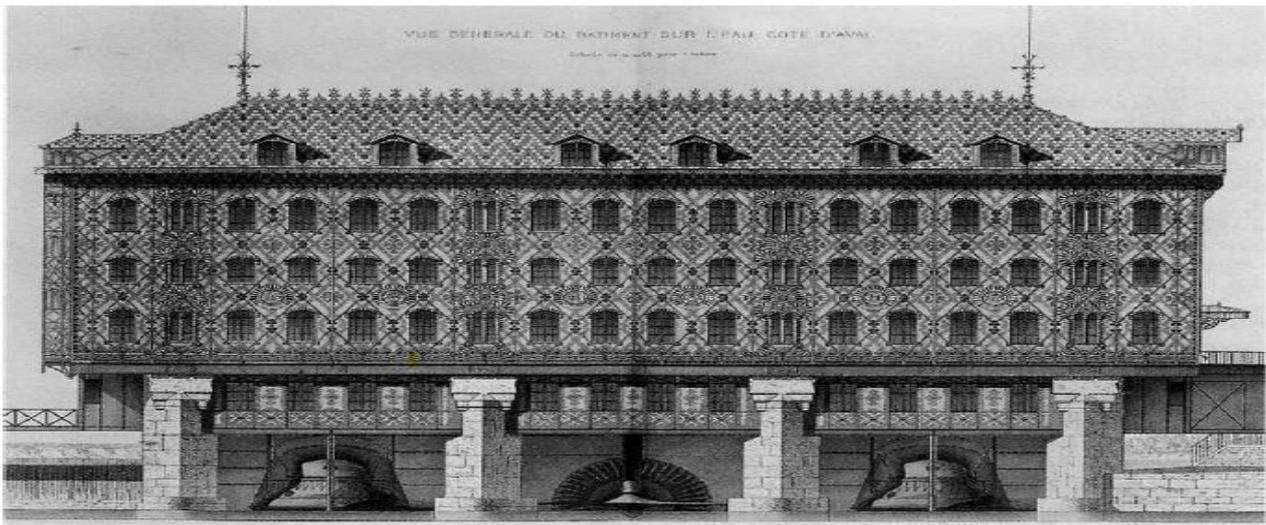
The trussed façade of the Chocolate Factory Menier at Noisel (from: [1])
